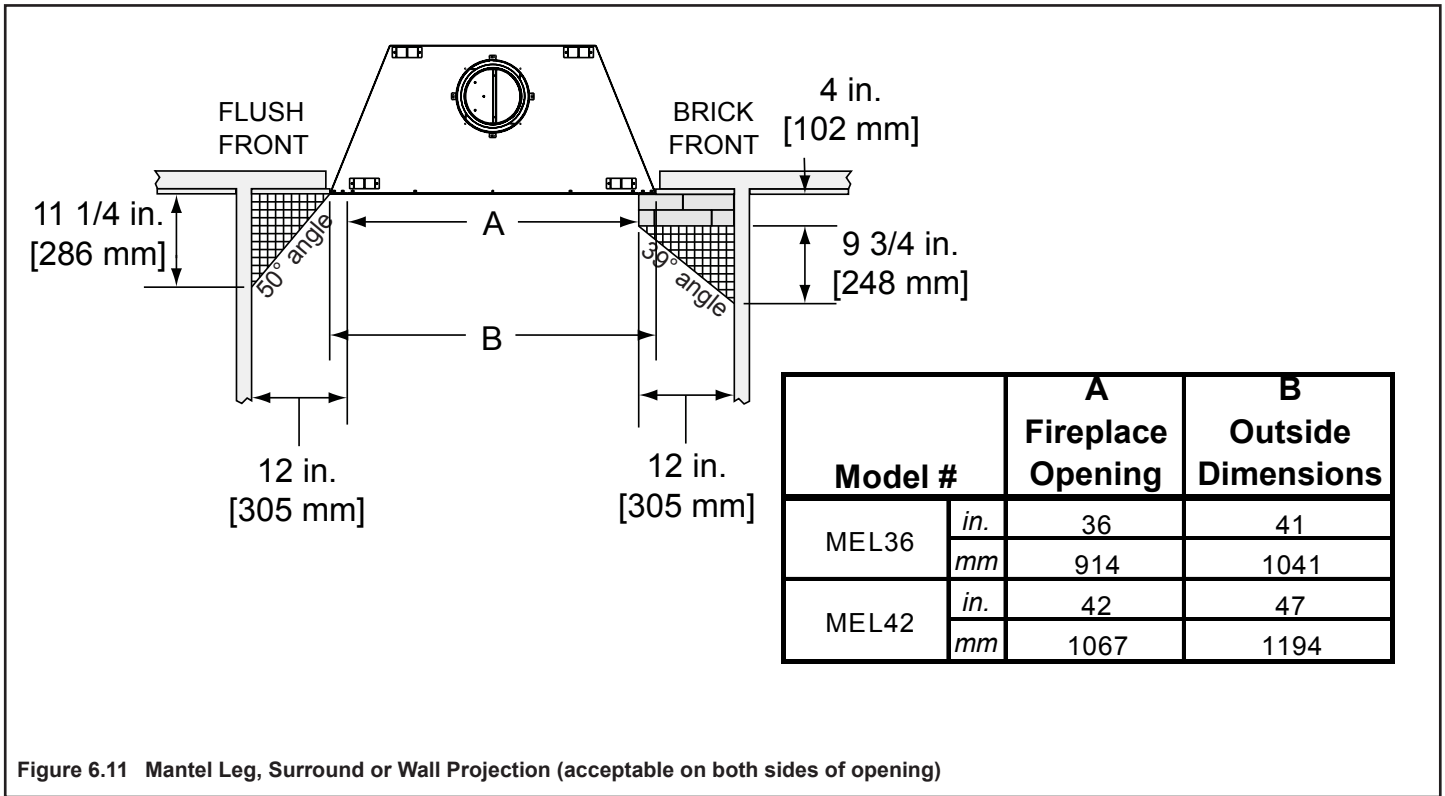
Mantel Leg, Surround or Wall Projection (acceptable on both sides of opening)
